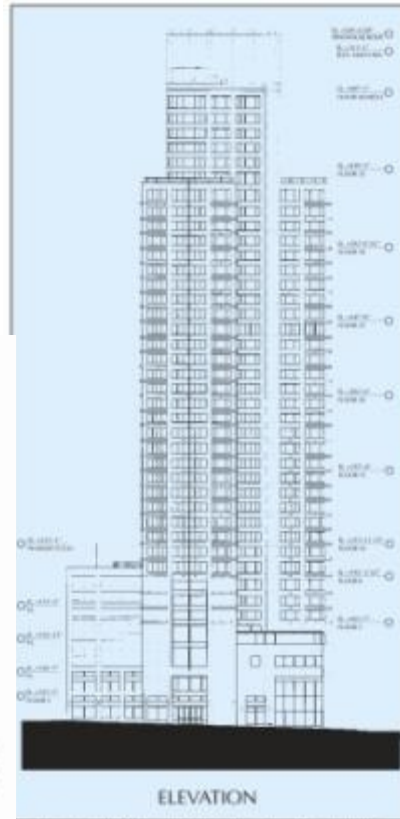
Elevation of building showing heights of various floors. Drawing courtesy: Sean Florko, Architect and Planning.
